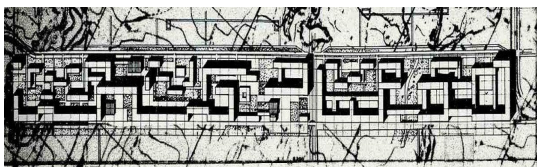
Detail of pedestrian zone (Islamabad Public Buildings and Civic Center Areas Proposed Layout No. 37, DOX-PA 204)
